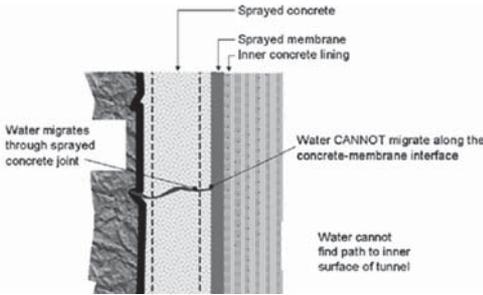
Fully bonded Masterseal® 345 waterproofing membrane preventing the migration of water along the concrete-membrane interface.
